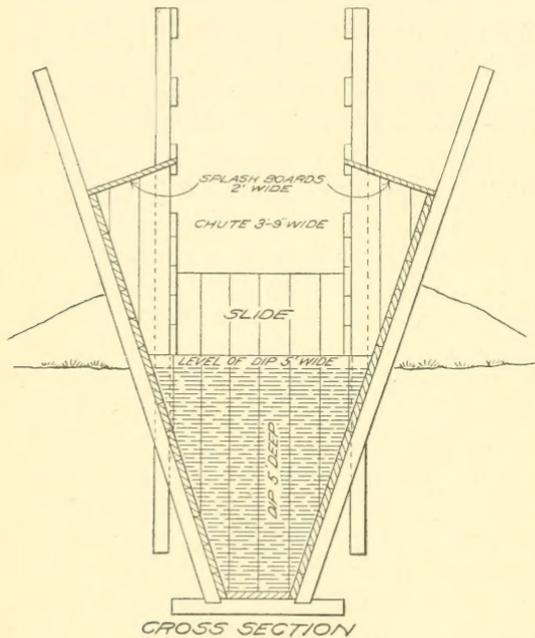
Cross section of dipping vat used by Mr. J. J. Welder.
